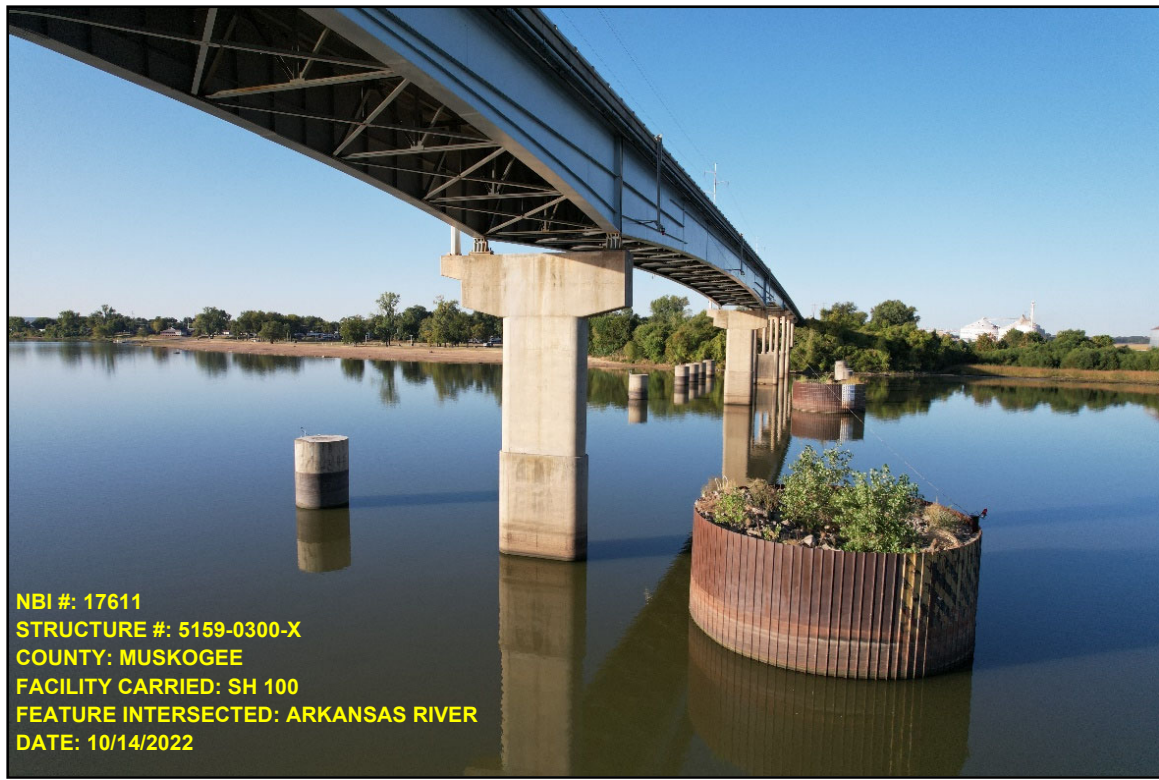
Pier 5, Typical Configuration of Piers 5 and 6
